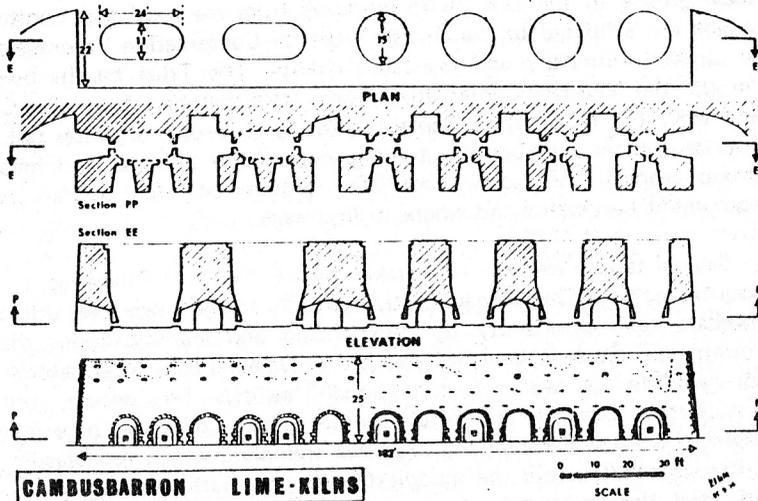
Plan and Elevation of Cambusbarron Lime kilns.
